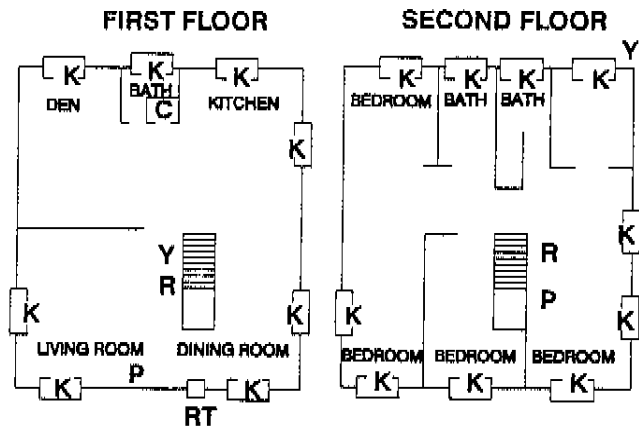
on page 1–2 details typical fire and burglar installation layouts. This can be used as a guide in planning the specific installation.
